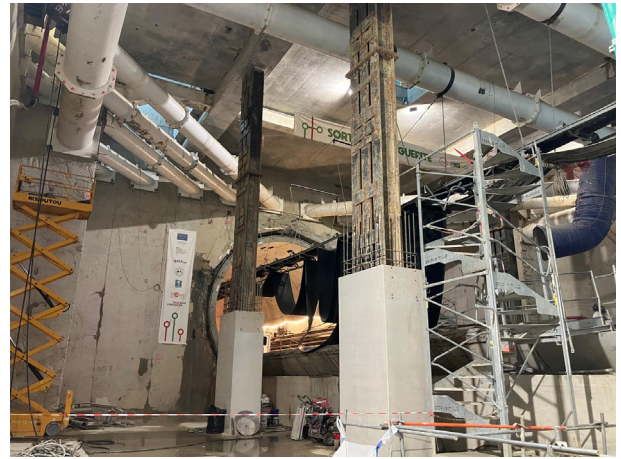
Ormeau Station – Photography of pré-installed columns (with the final column partially completed)
